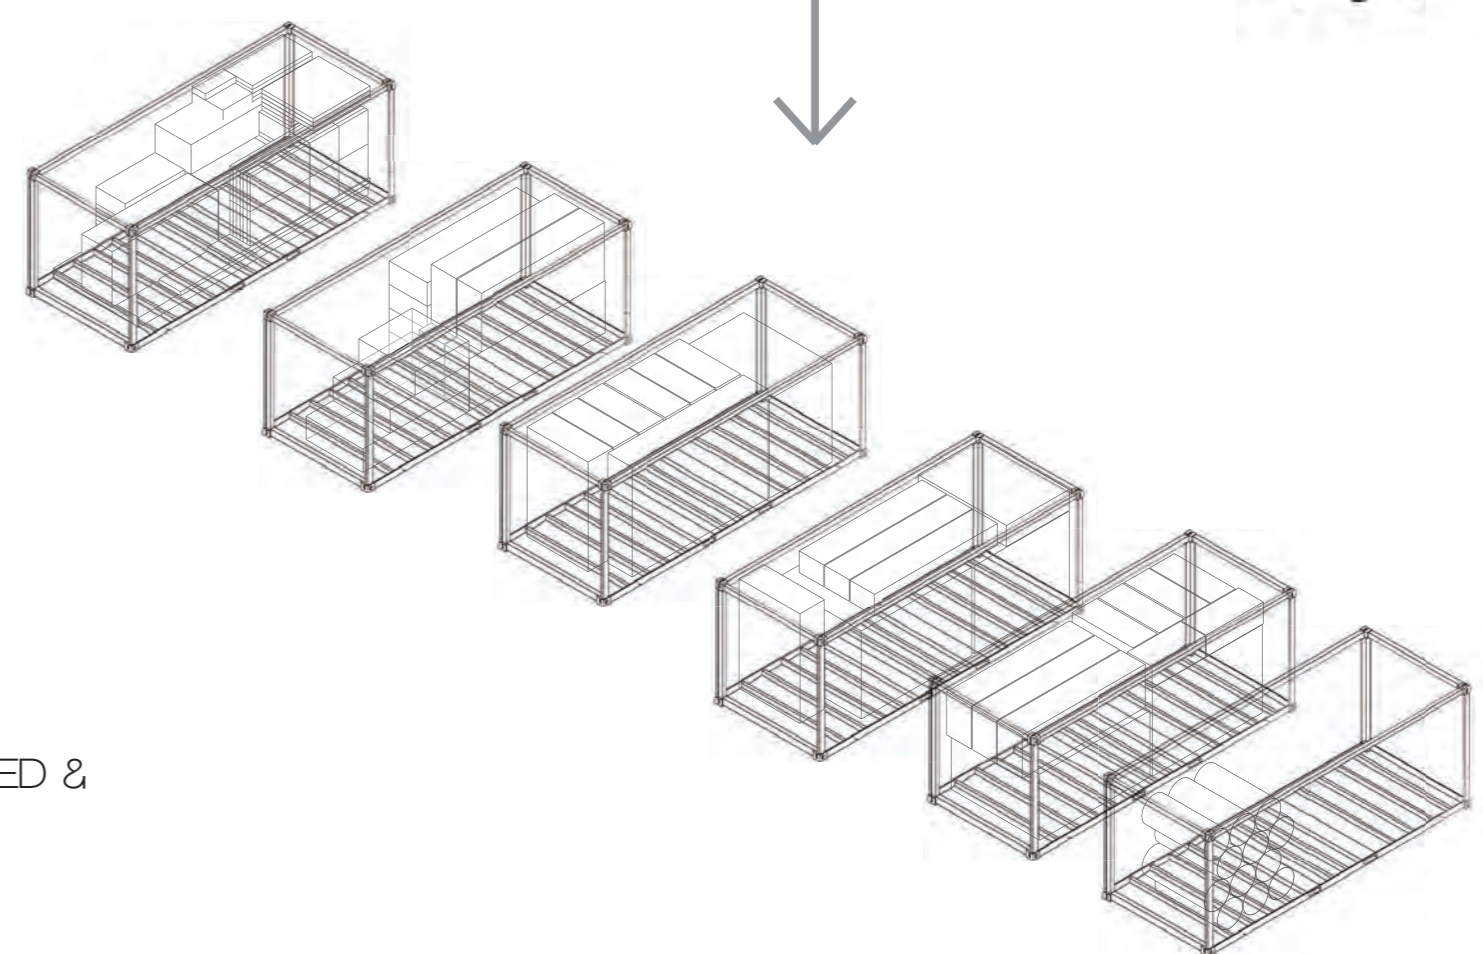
ALTERED BUILDING EXTERIOR DISMANTLED & ARRANGED IN CONTAINERS
